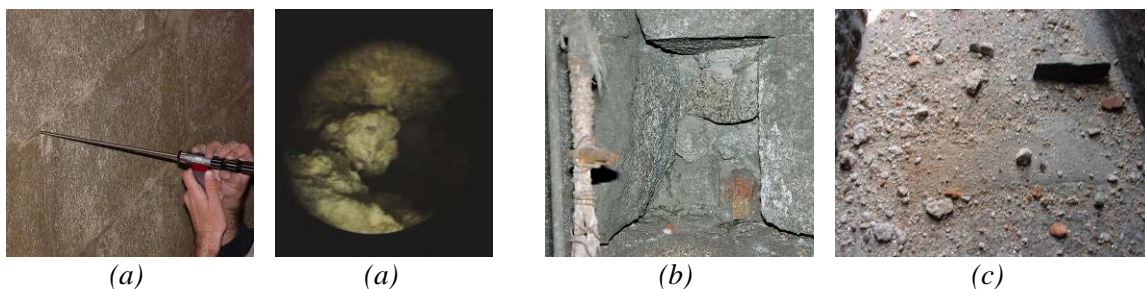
Visual inspection to define the constitution of masonry walls: (a) boroscopic camera, (b) opening up the structure (c) loss of material through central cracks in the openings.
